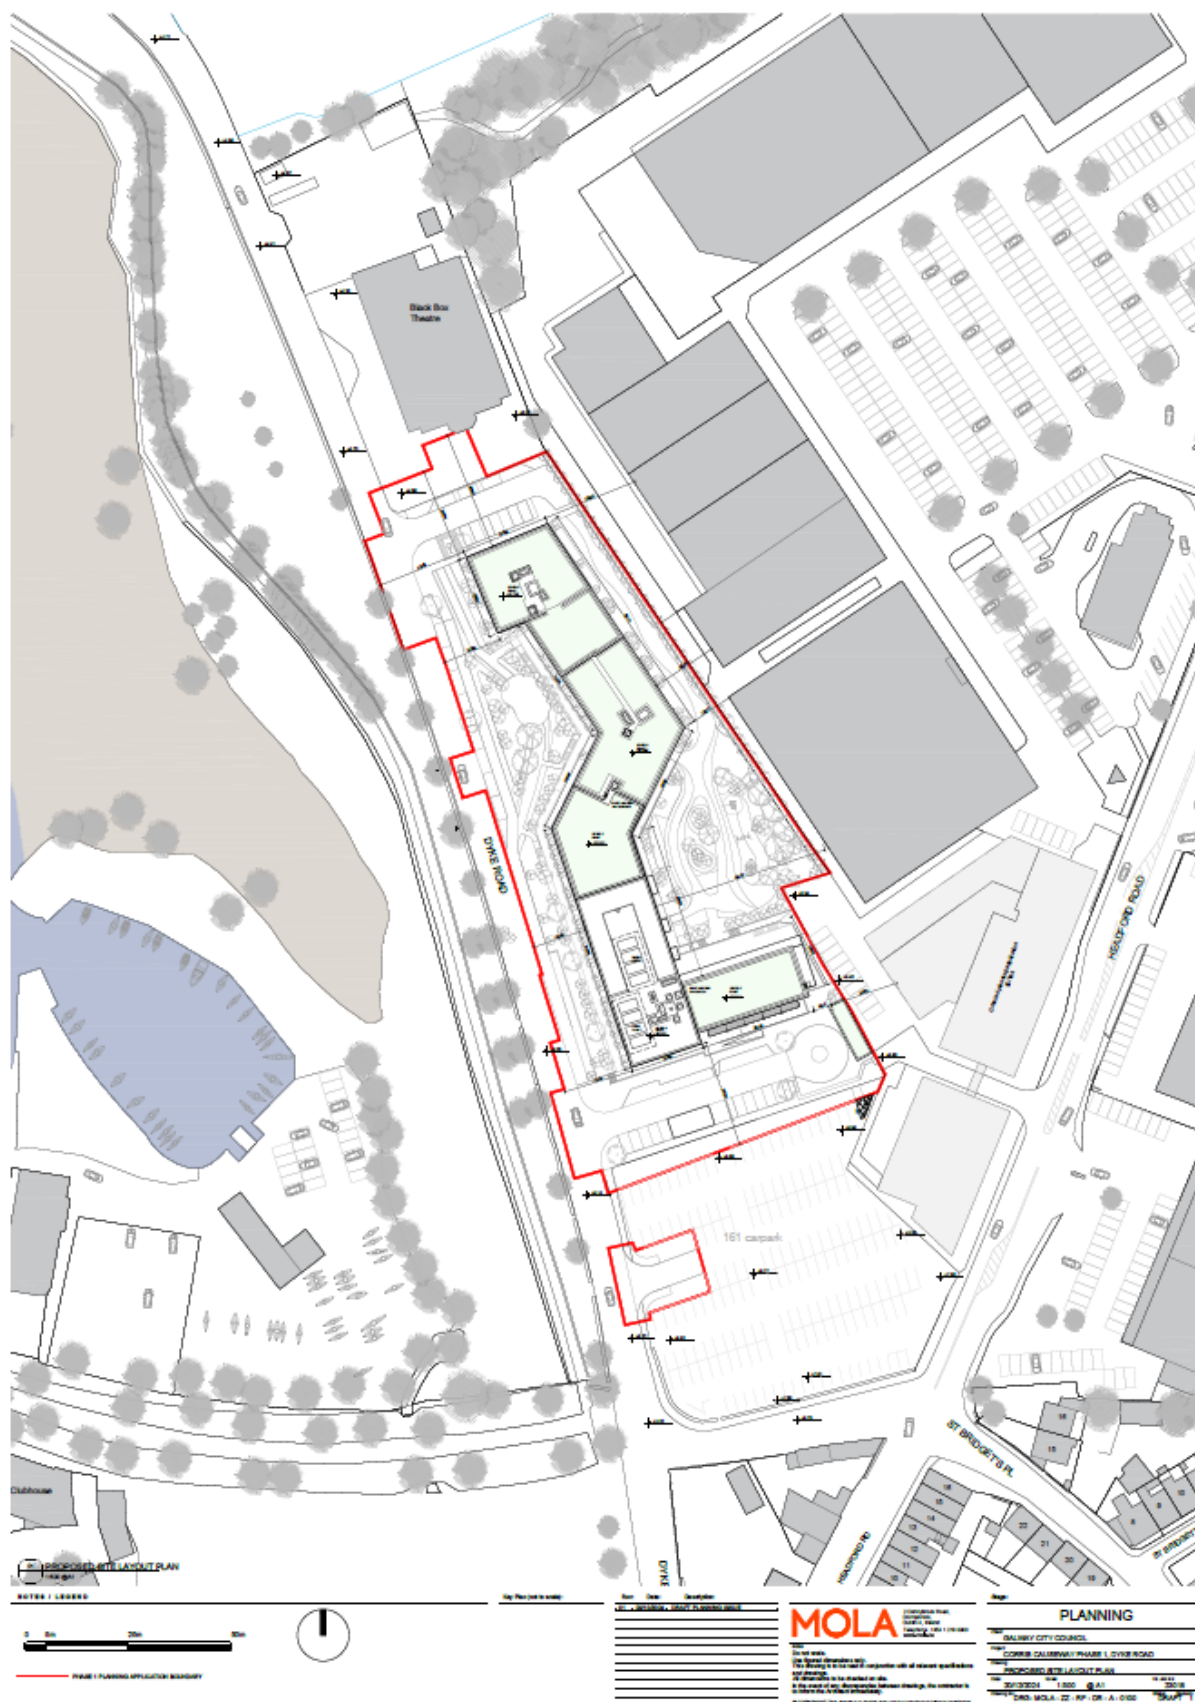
Proposed Development Site Layout (MOLA, 2024)
